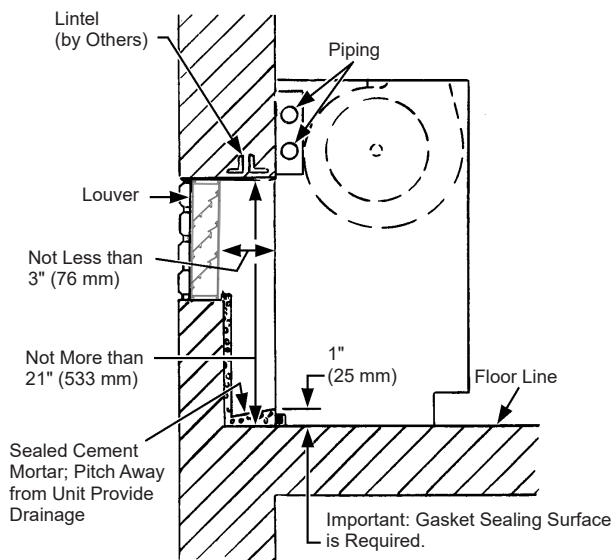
Above Floor Level Outdoor Air Intake Using Arrangement AV or AL with Accessory Closed Pipe Tunnel
